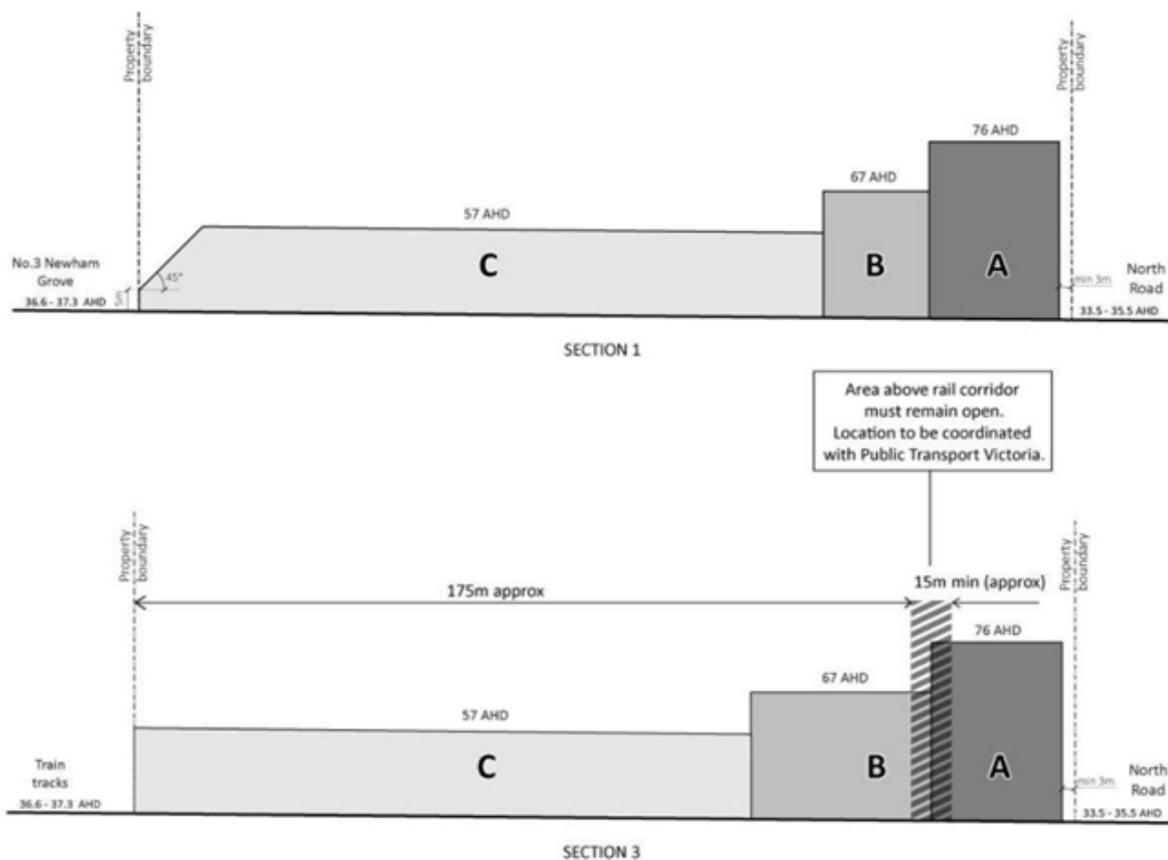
Side cross section view of proposed building envelope (Source: Level Crossing Removal Project Integrated Development Opportunities Standing Advisory Committee)
